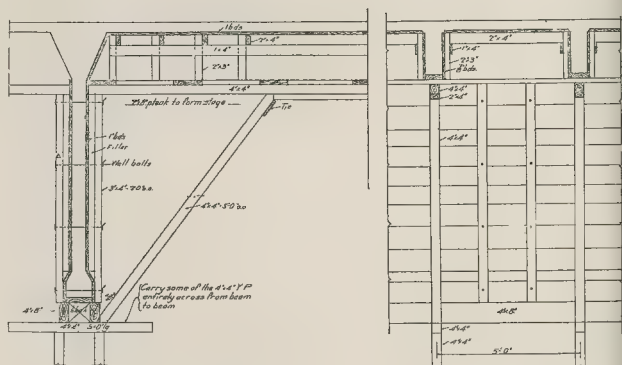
SECTION AND ELEVATION OF CENTERING USED ON AN 80-FT. GIRDER.
